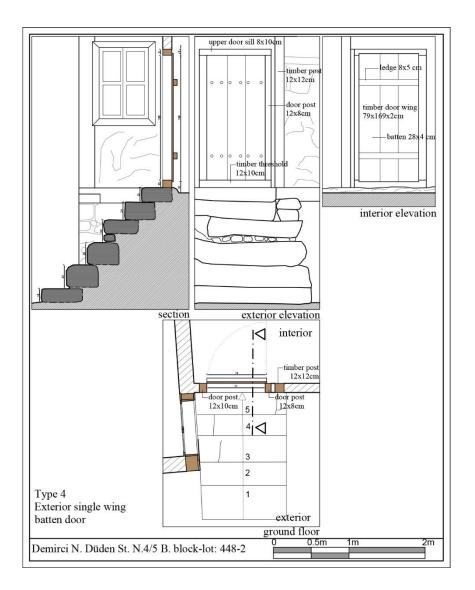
Drawing of exterior single wing batten door located on timber framed wall, Type 4 (Demirci N. b. block-lot: 448-2)
